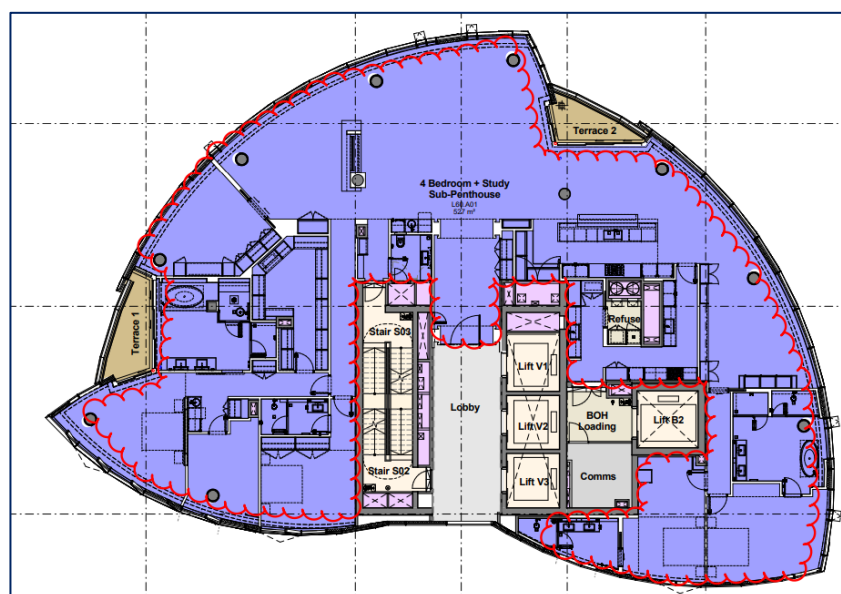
| Proposed four bed + study apartment layout on Level 60 (Source: MOD 2)
